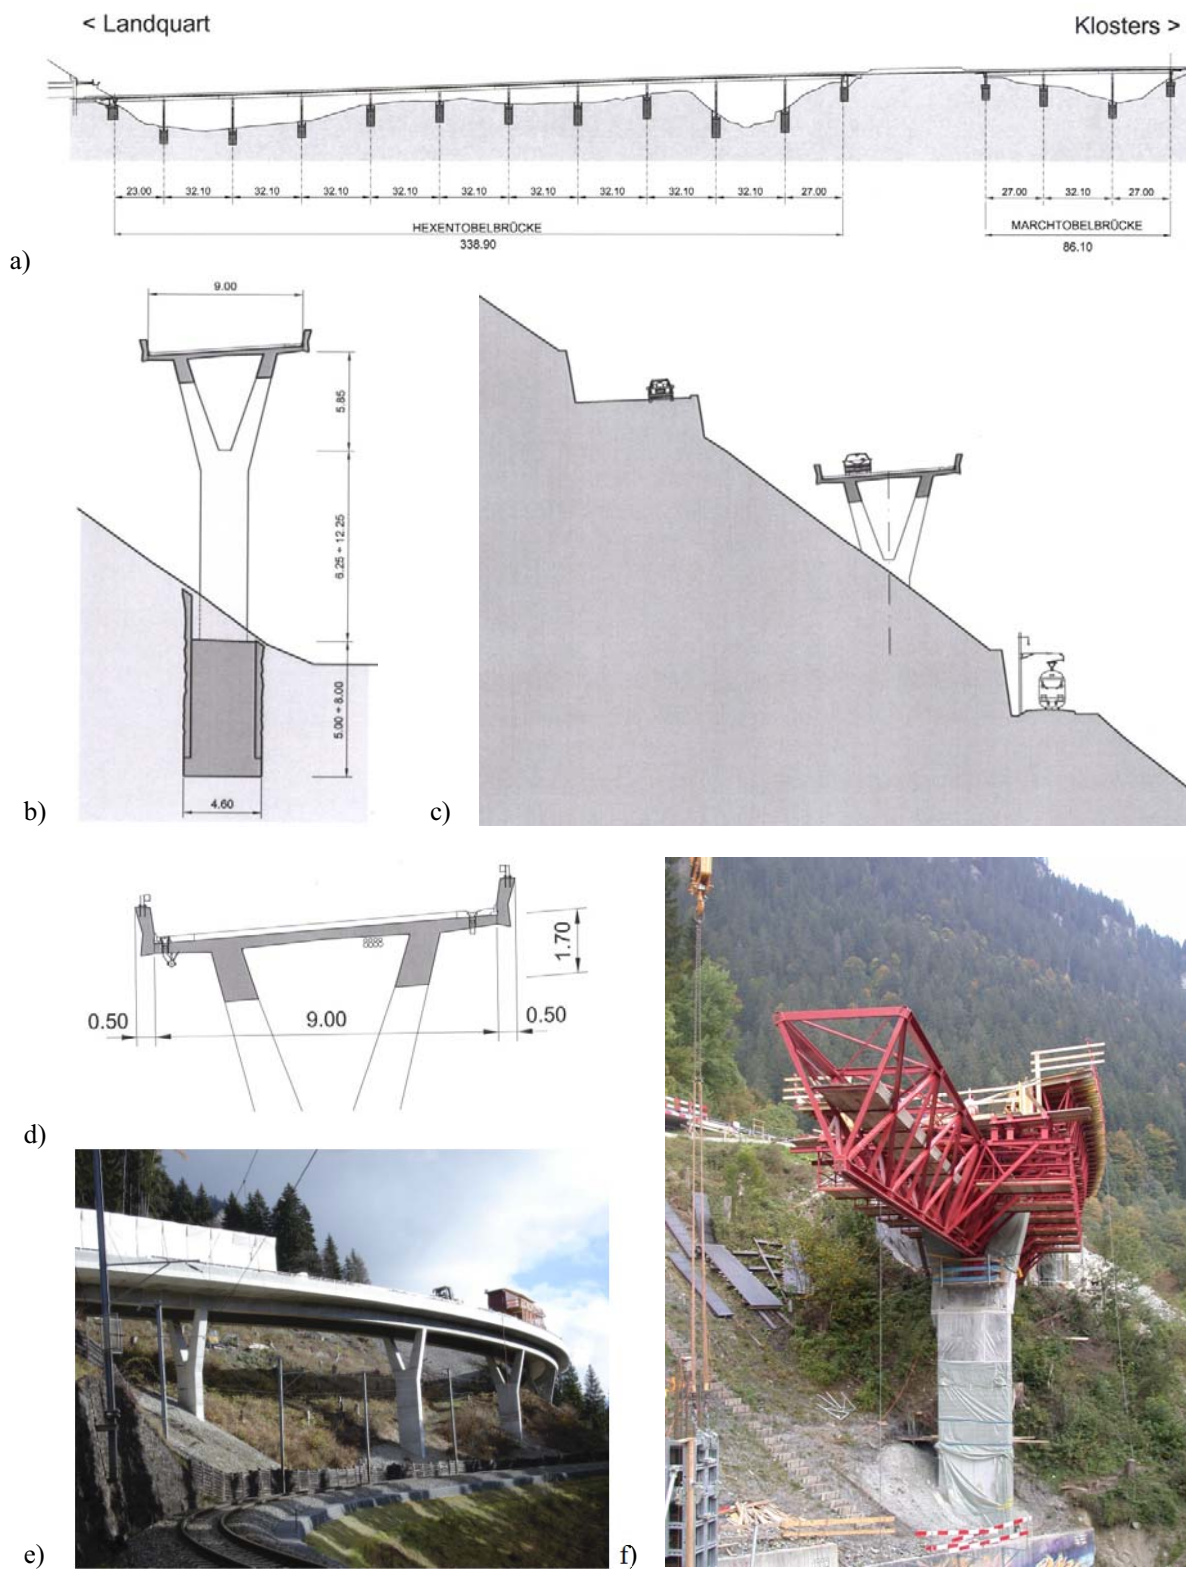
The Hexentobel and Marchentobel bridges: (a) view of the bridges; (b-d) typical cross section; (d) bridge after construction; and bridge under construction (adapted from [13])
